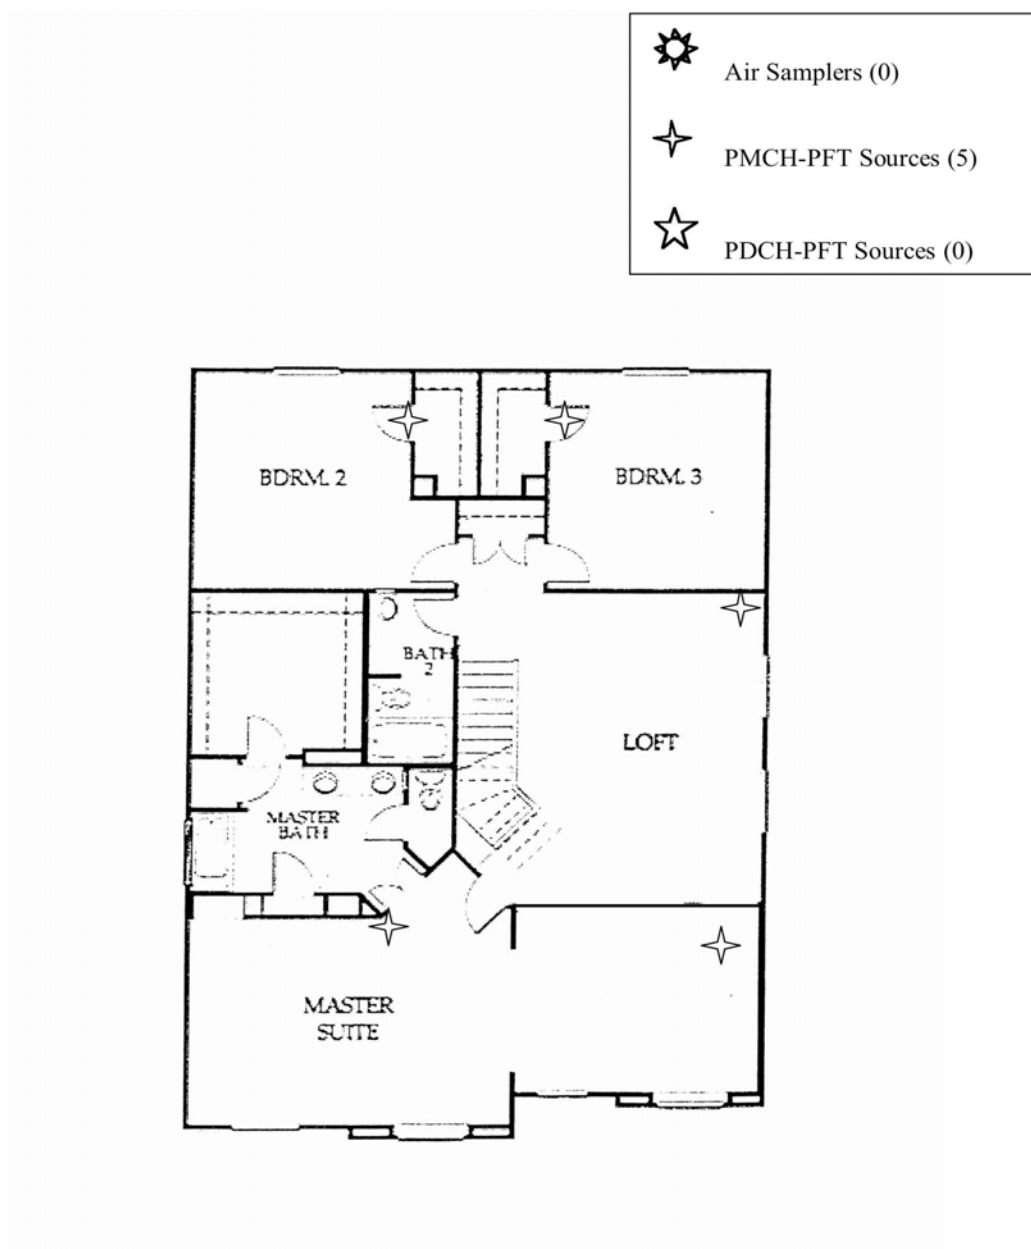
Floor plan of P3 second floor, depicting the locations of the PFT sources.
